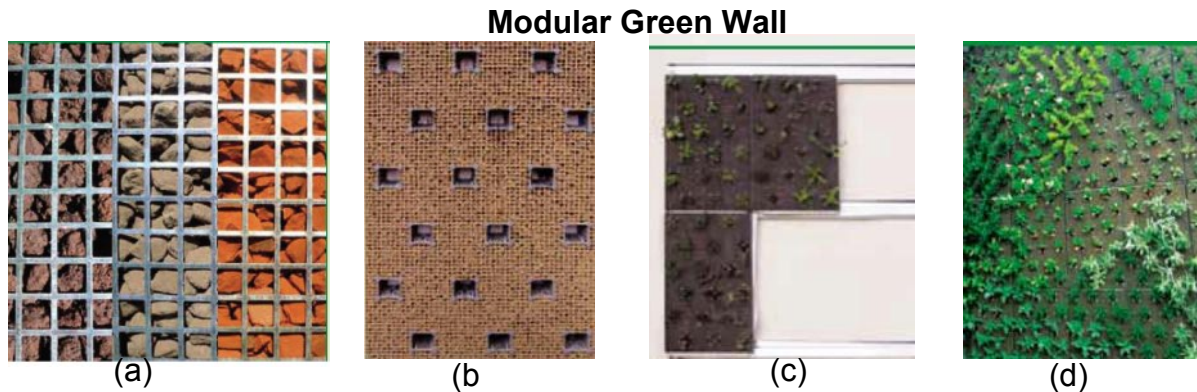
Modular Green Wall (source; Sheweka & Mogdy, 2011)
